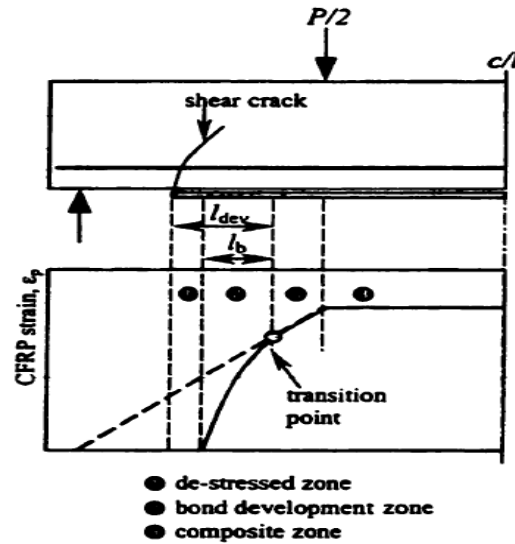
Composite model of concrete beam bonded with FRP plate (Ngujen et al., 2001).
